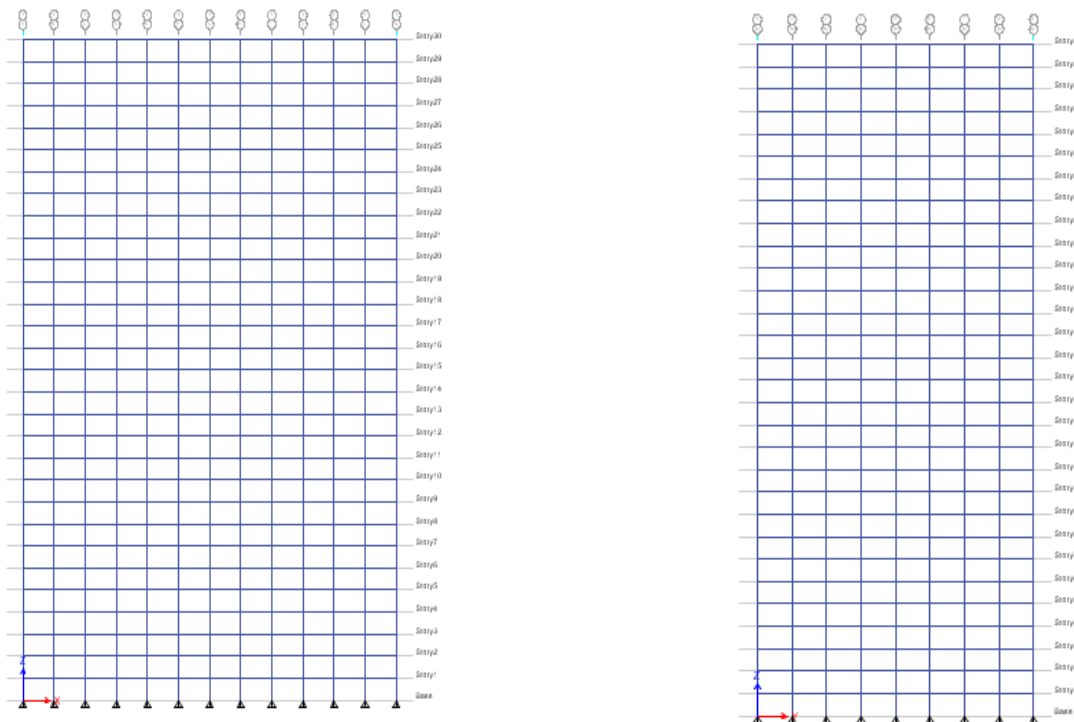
Elevation of tube in tube structure without bracing in X and Y direction
